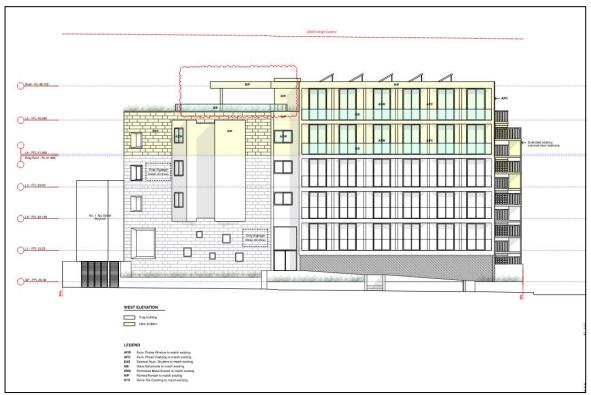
Western Elevation - Fronting Anzac Parade towards ES Marks for 2 Anzac Parade, Kensington (Source: Applicant)
